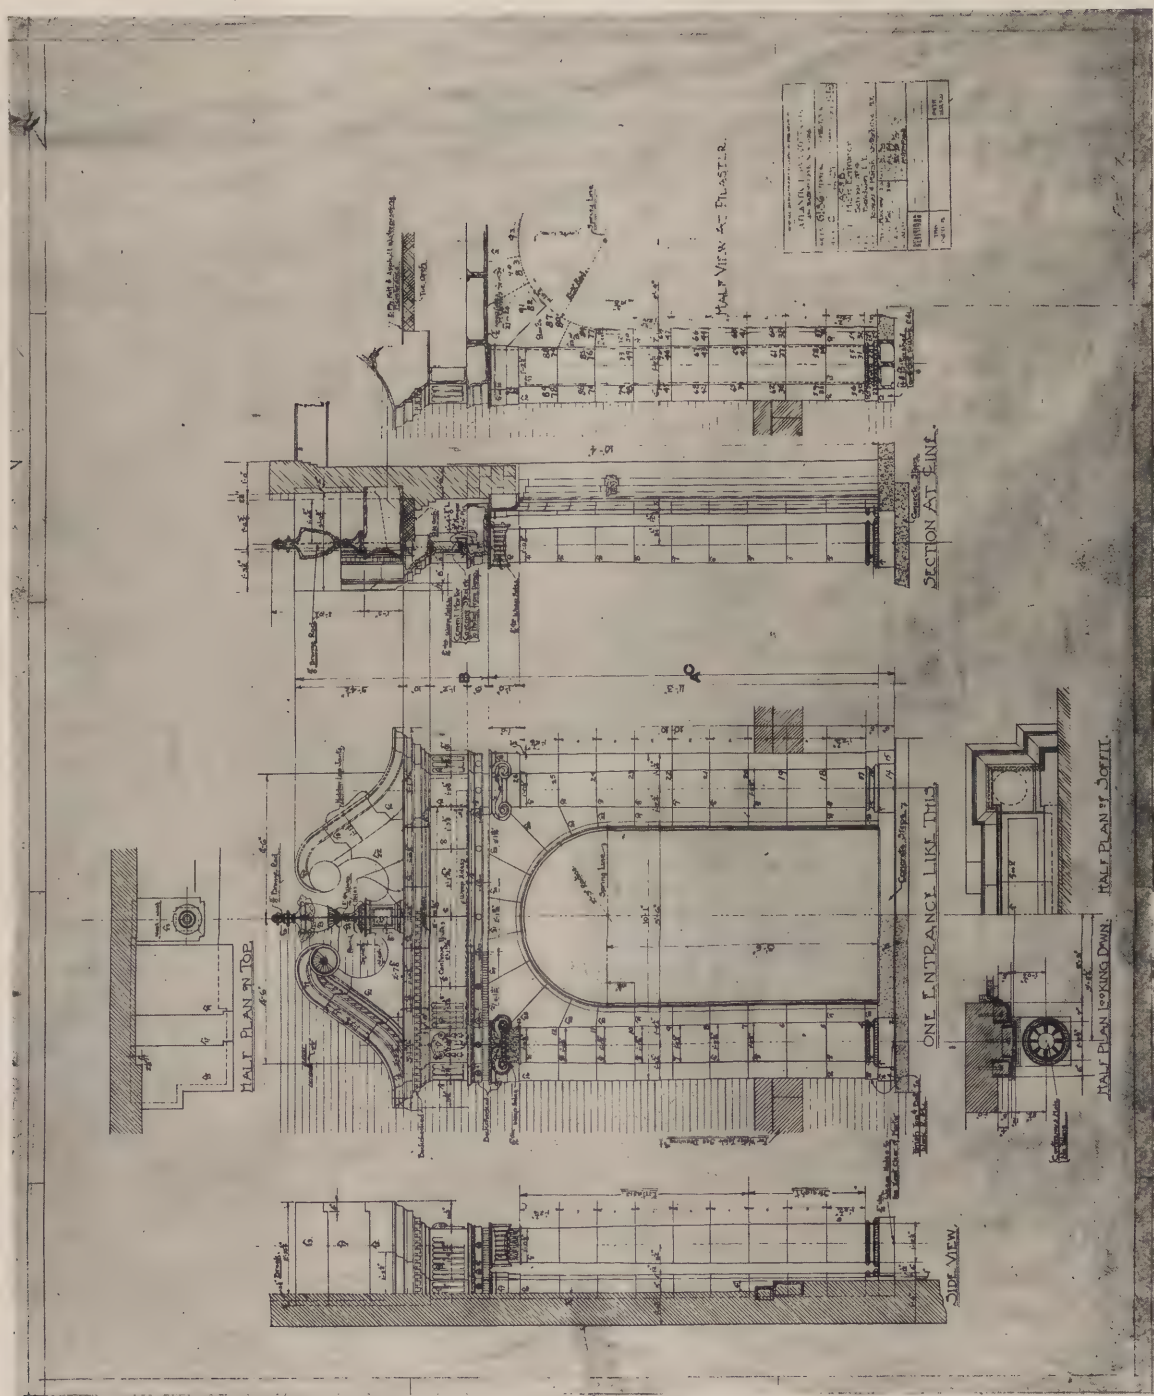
Terra Cotta Shop Drawing of an Entrance Door Feature of a School Building.
